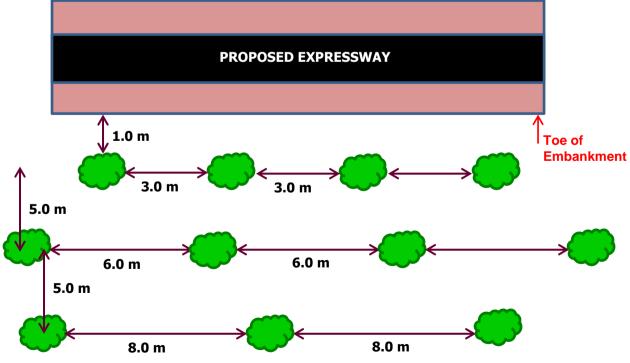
Pattern of Plantation (Number of Plants / row and row to row distance)
